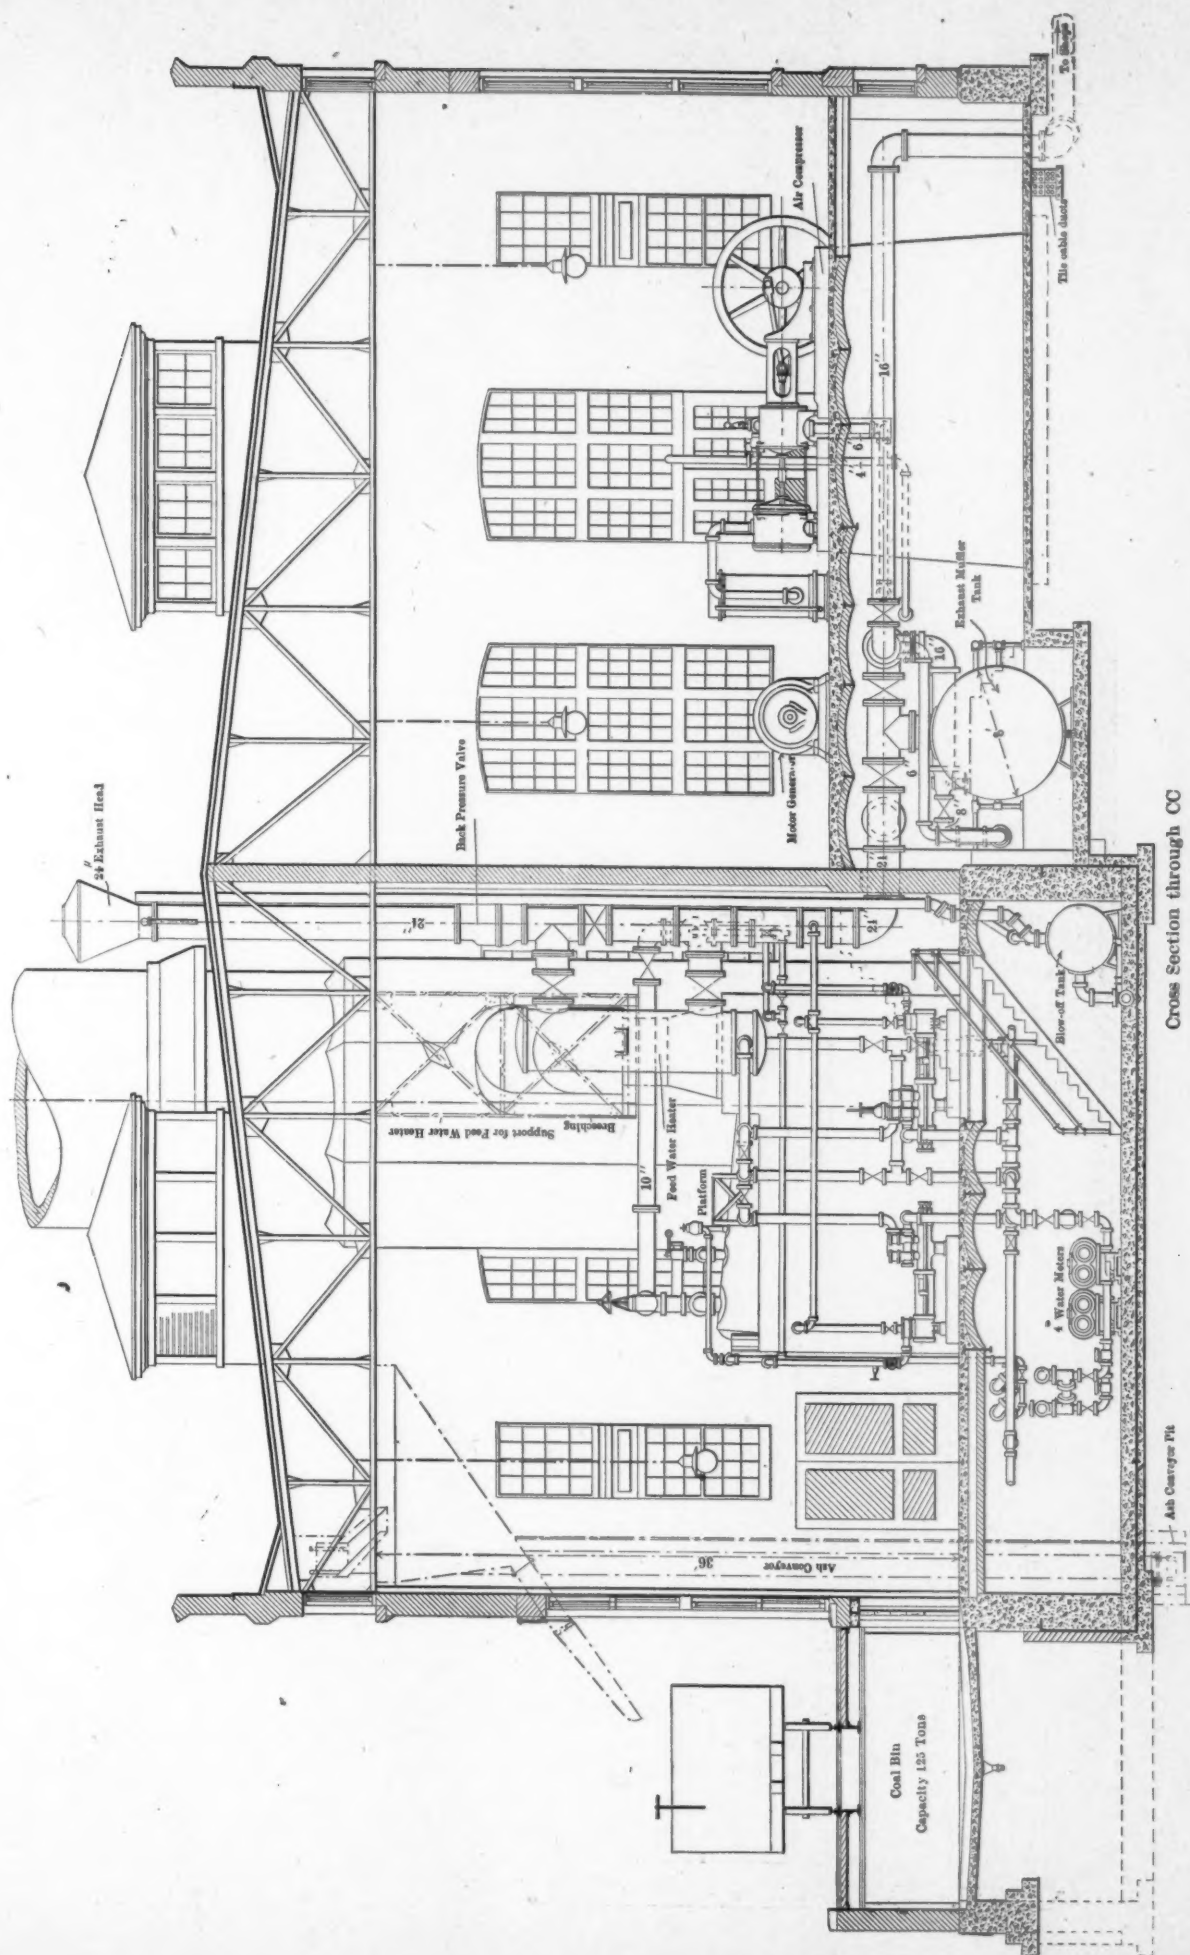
SECTION THROUGH BOILER AND ENGINE ROOM SHOWING AIR COMPRESSORS AND EXHAUST AND BOILER FEED PIPING.
